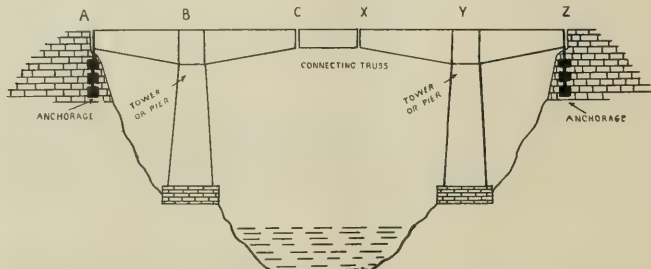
SKELETON VIEW OF TYPICAL CANTILEVER BRIDGE.
